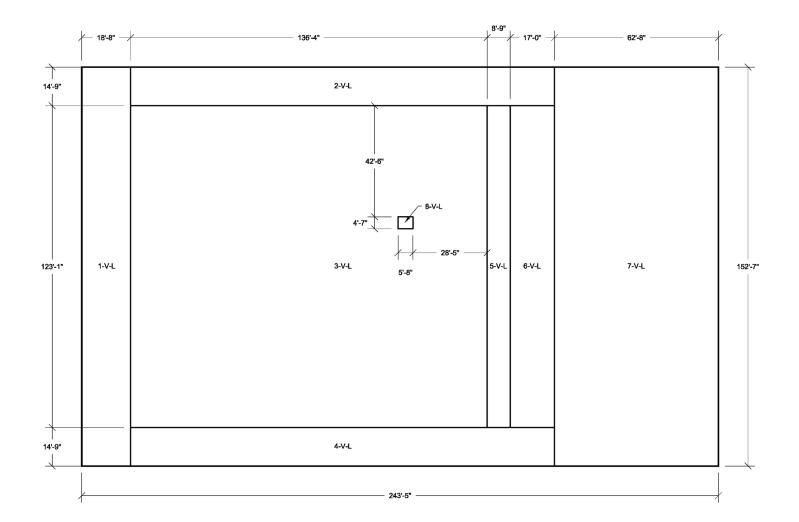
H.3-29 Basemat Looking Down North-South Reinforcement Zones Near Side Face
